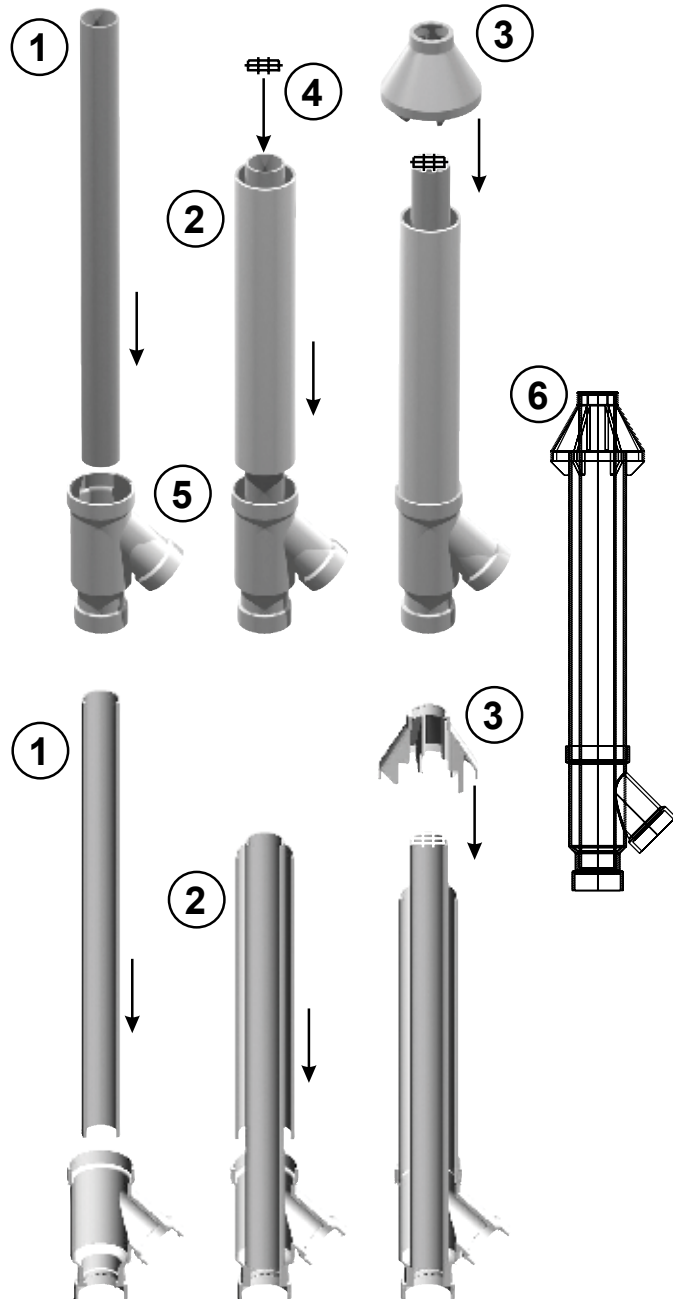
Sidewall air inlet (termination) for direct vent: vertical vent / sidewall air
